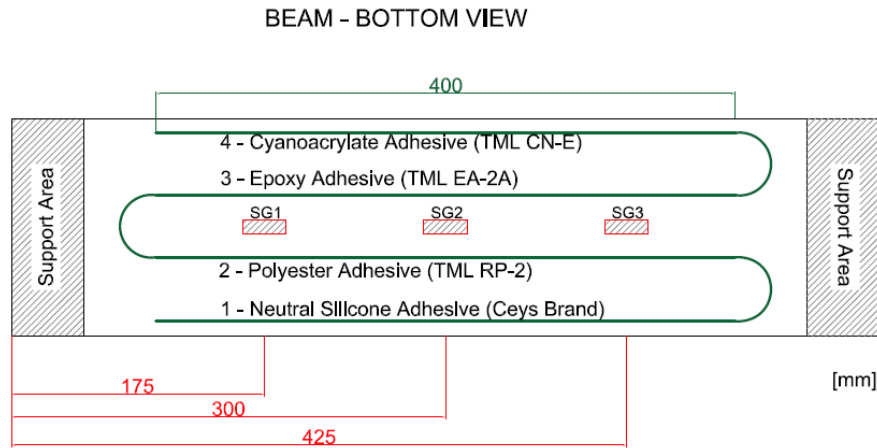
Plan of the reinforced concrete beam and its instrumented sensors (DOFS and strain gauges)
